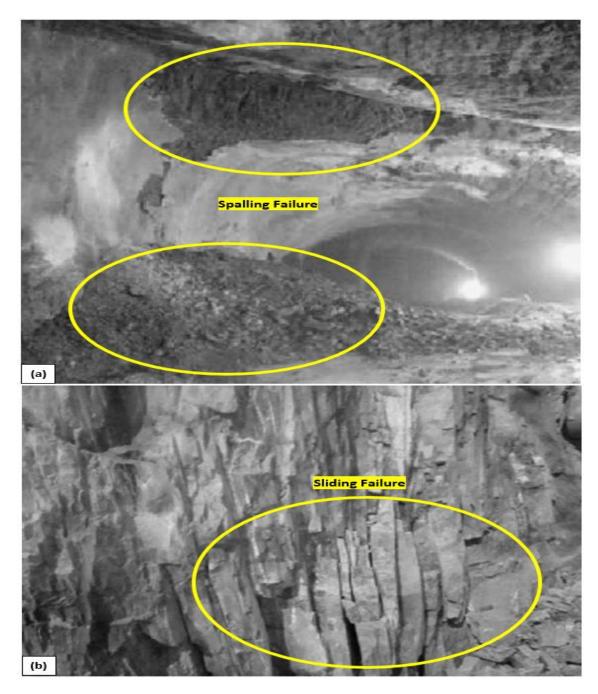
Failure modes observed in the deep underground excavation; (a) spalling failure, (b) sliding failure
